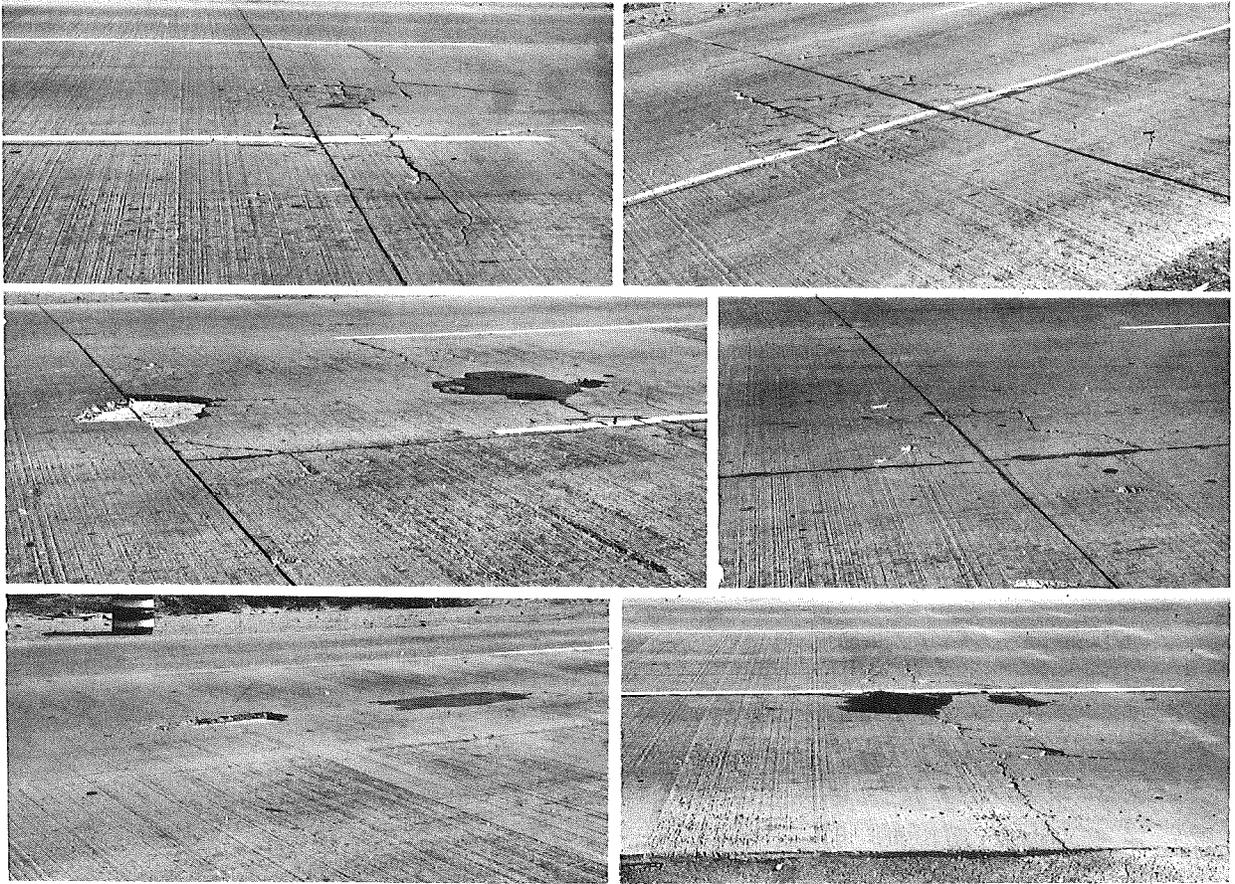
Examples of overlay failures, mainly within the western or 120 lb/cu yd section. However, similar failures in earlier stages of development, were noted in the outside two lanes of the 200 lb/cu yd section.
